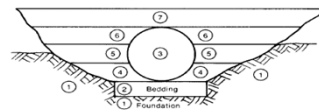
Typical inspector’s document for construction control of large corrugated steel pipe structures.
